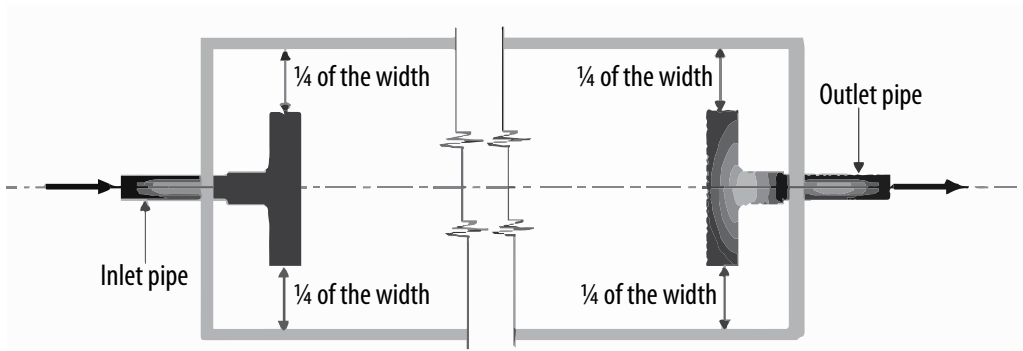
Plan view to show the layout of the inlet and outlet piping (Njau et al., 2010).
